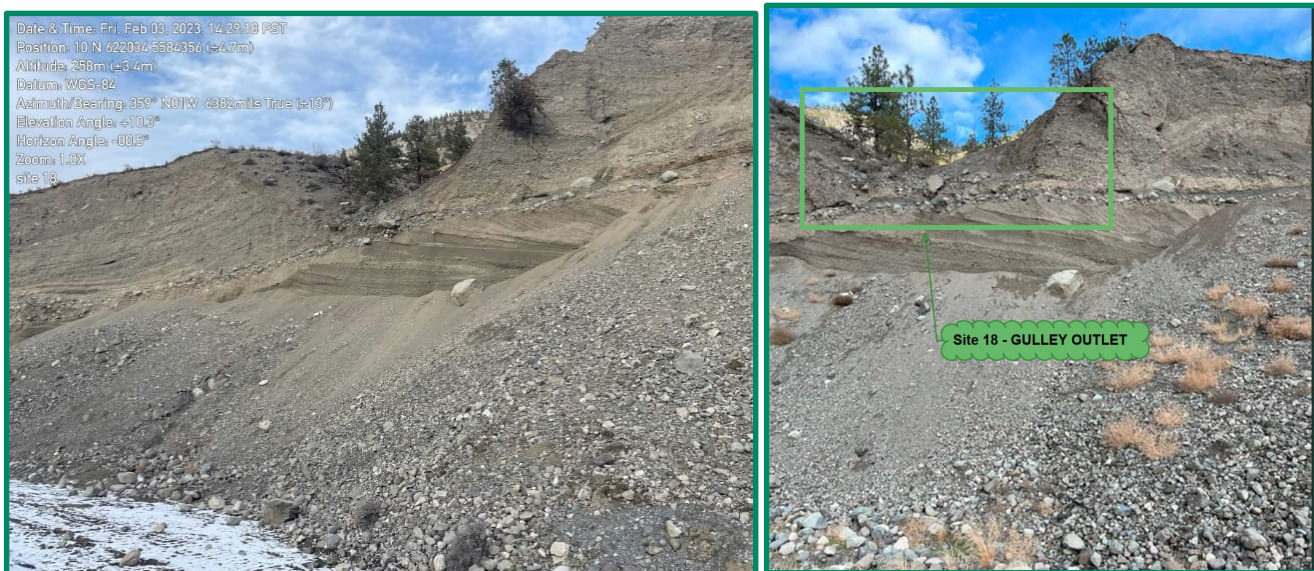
Site 18 Gully Outlet Immediately Upstream of Highway -8
